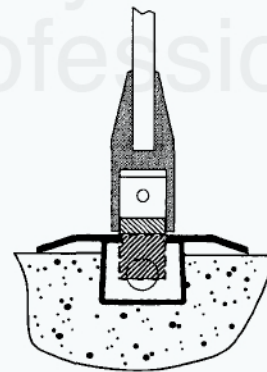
Swinging door. Lock mortised in floor of threshold. Armature mortised in bottom of door. (E08601)
